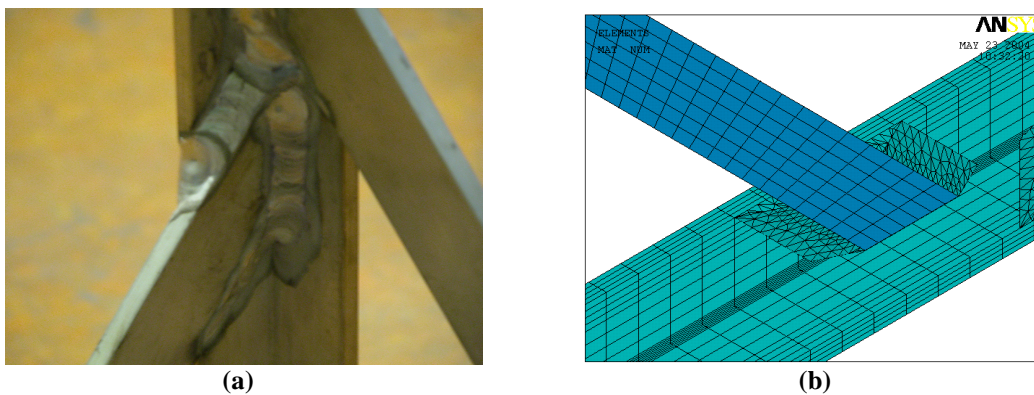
Close up of ITF showing large welds used to secure the cross braces (a) and approximation to these welds included in the FE model.
